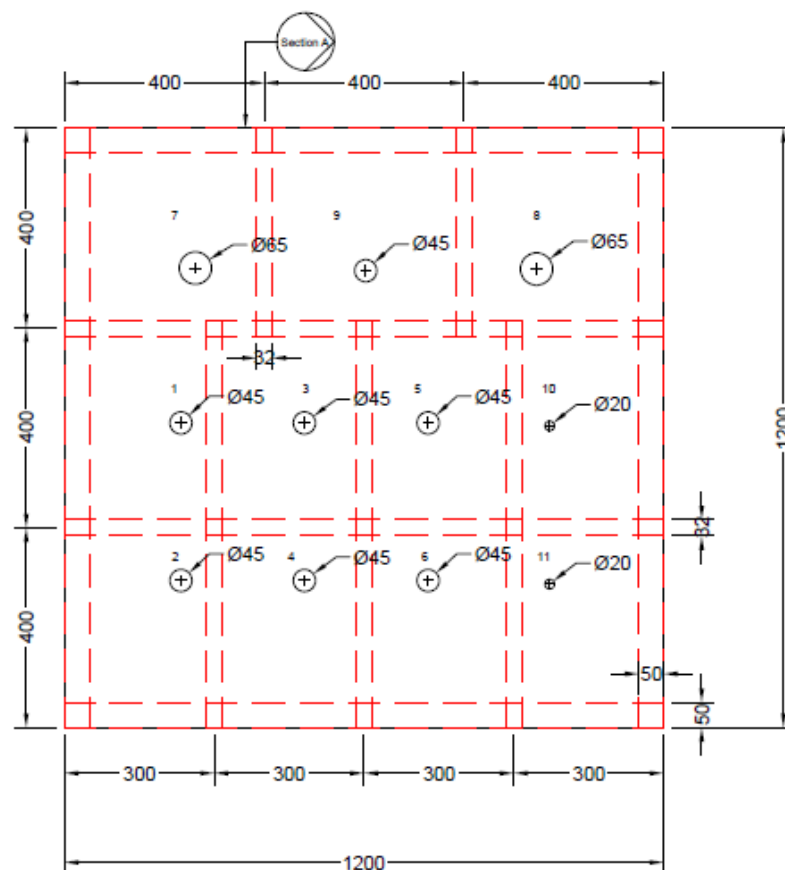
Test 1 – Elevation – Fire Side.pdf
